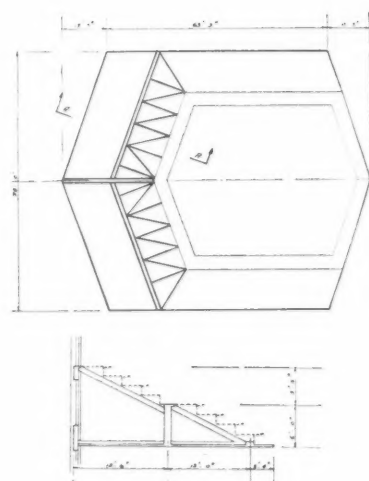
Gallery construction in the hall at Woodberry Down School, London. Robert Matthew [4], Architect to the L.C.C.
